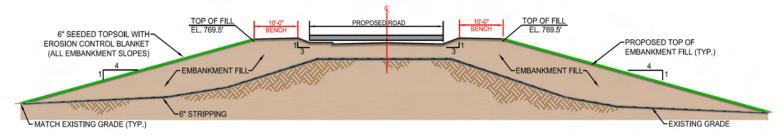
Watts Bar Dam - Raised Access Road Concept
